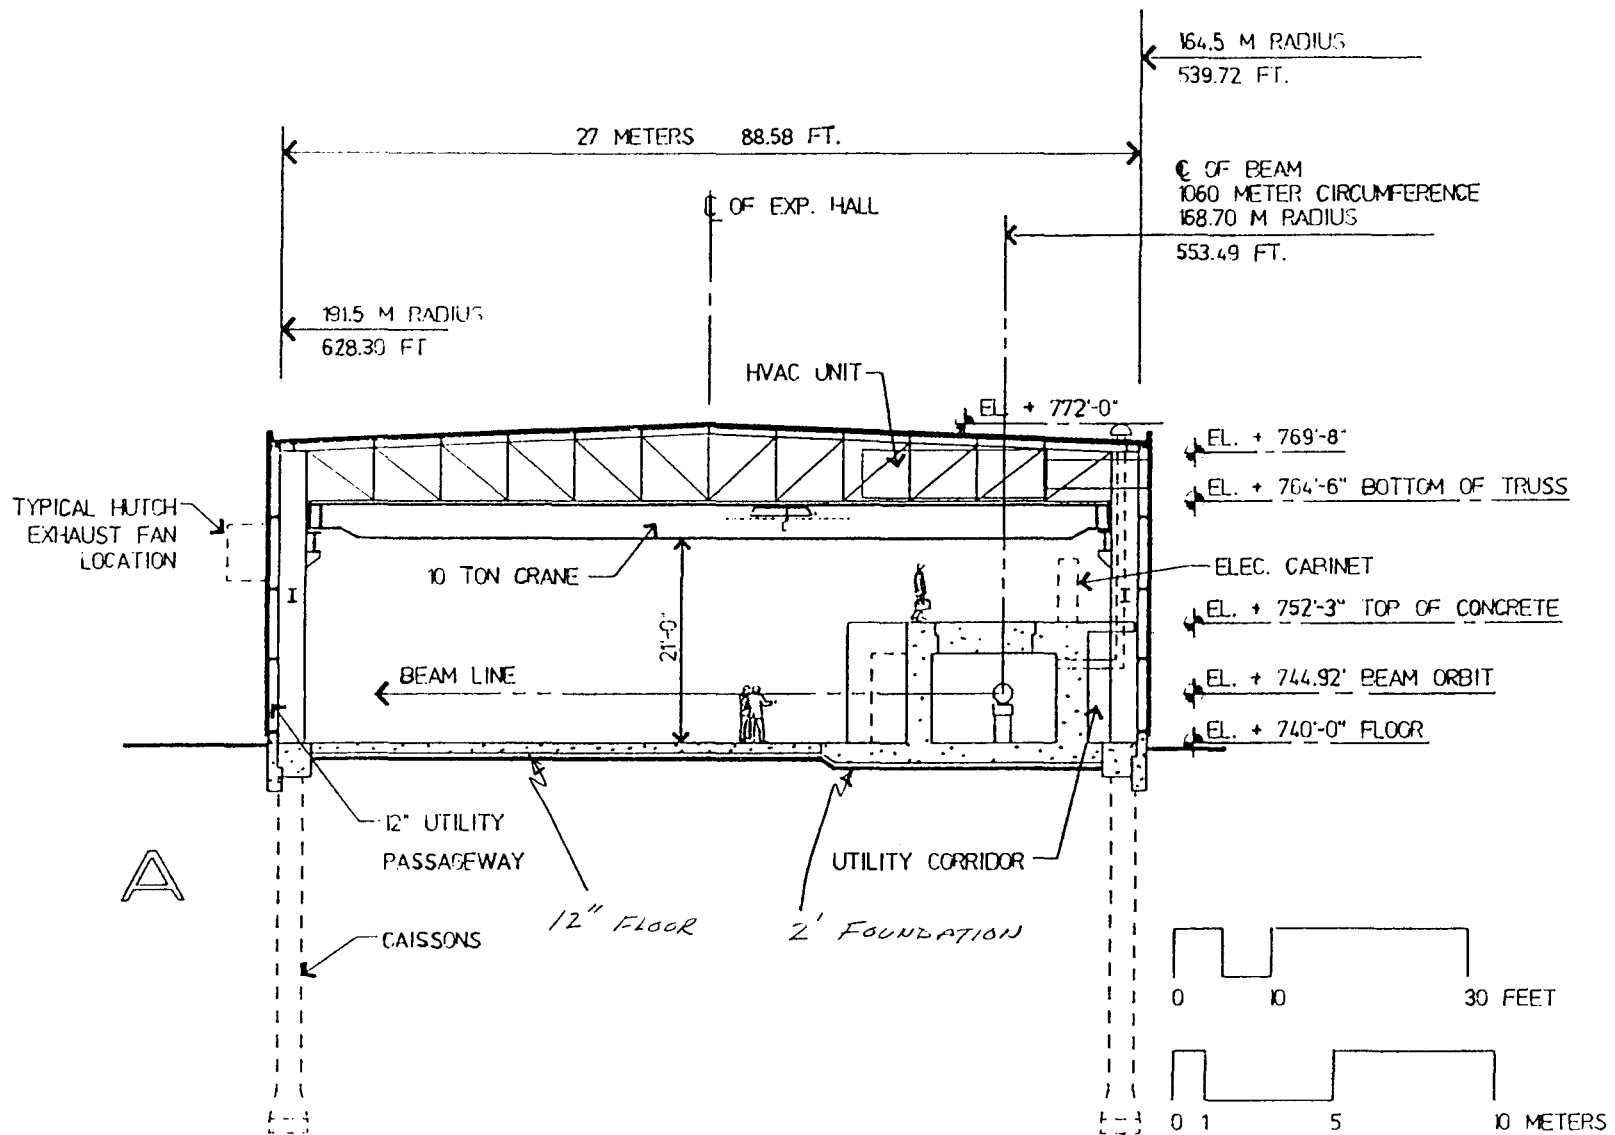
Cross-section through 7-GeV APS Experiment Hall
